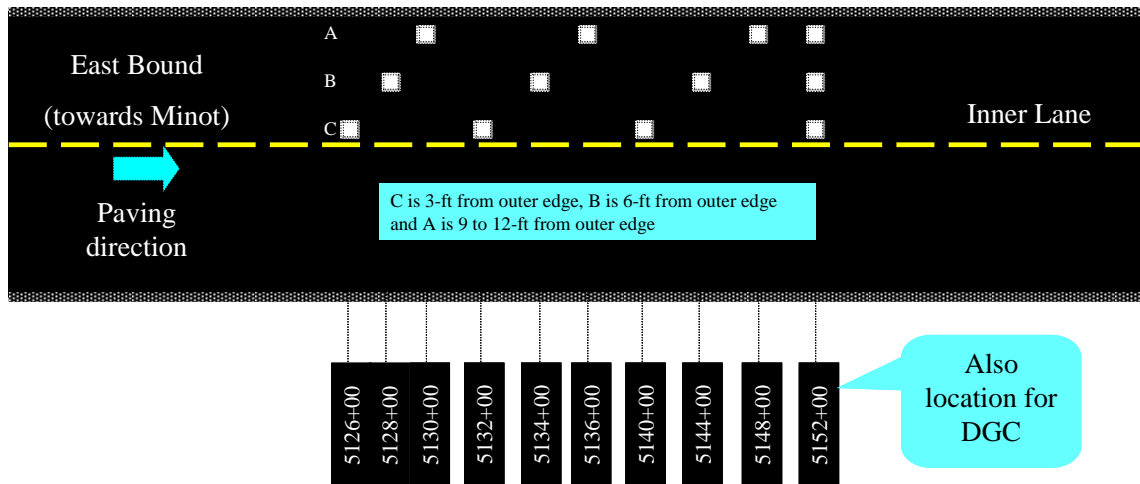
General Layout of Test Points Along Section 2 of HMA Layer; Route 2 Near Stanley, North Dakota
